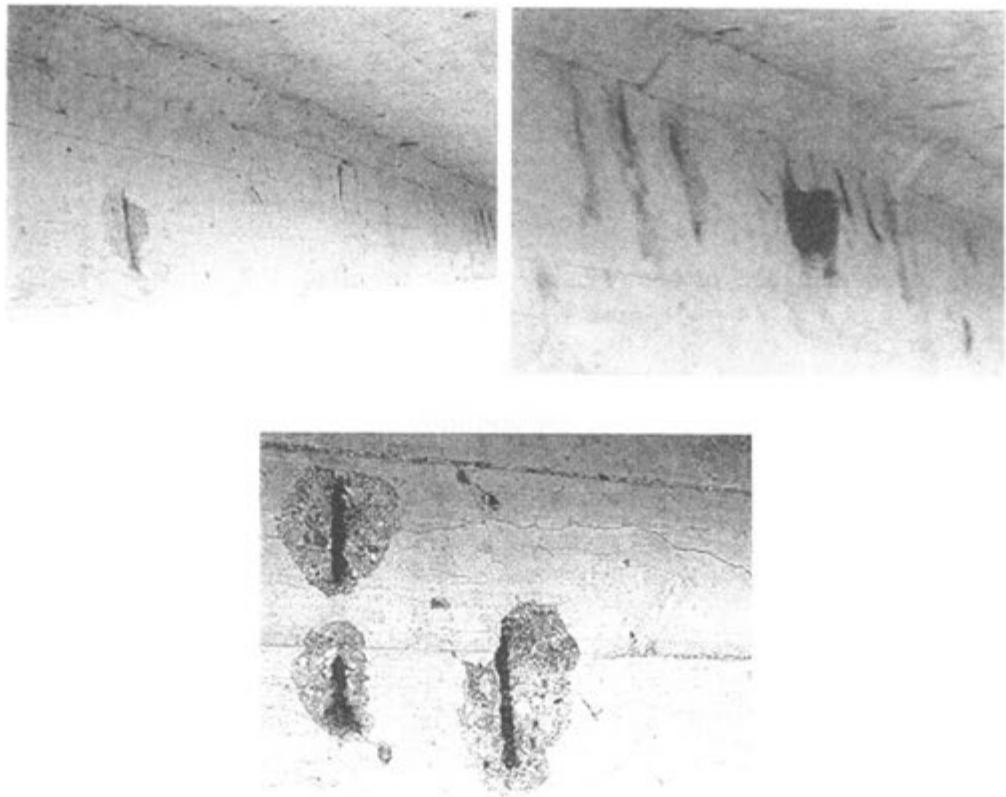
Miscellaneous Spalling and Delamination Areas on Concrete Beams
